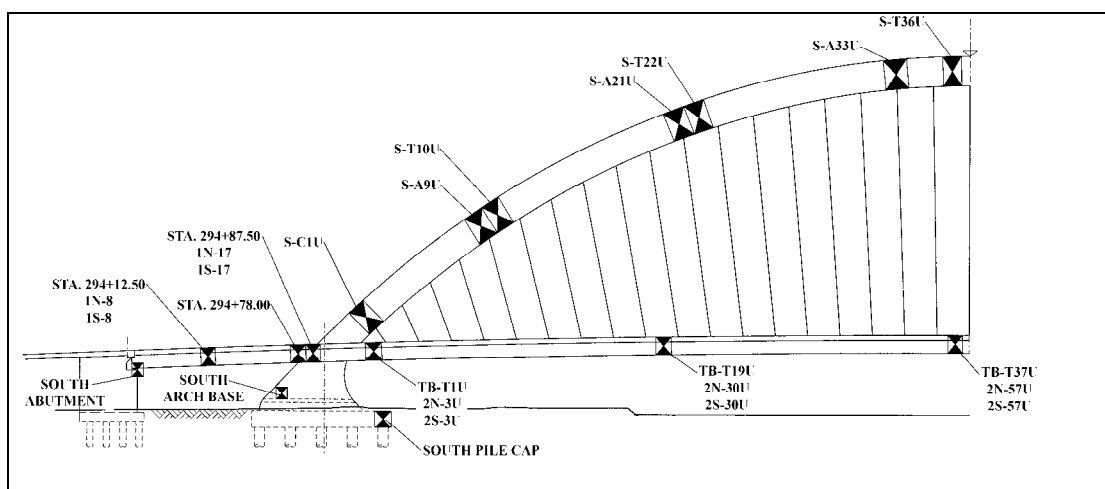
South Permanent Gauge Locations (Modified IRIB Specifications and Construction Plans)
